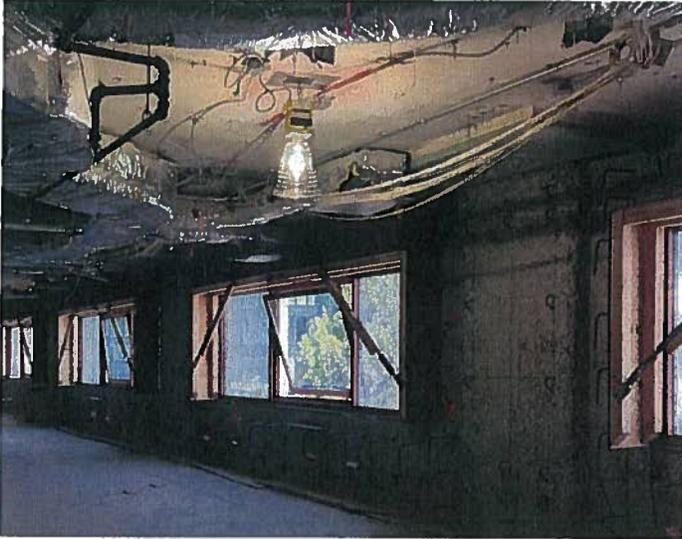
Steel reinforcing dowels embedded in existing perimeter walls for wall seismic strengthening on Level 4 (October 2013).
